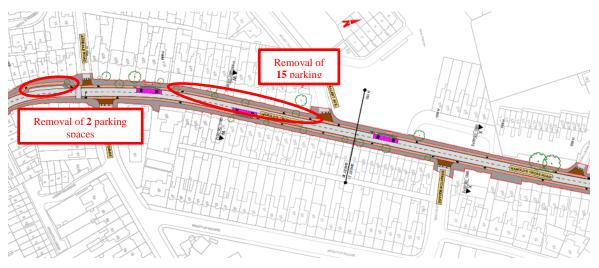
Proposed scheme design on Terenure Road North and Harold's Cross Road (between Ashdale Road and Brighton Square)
